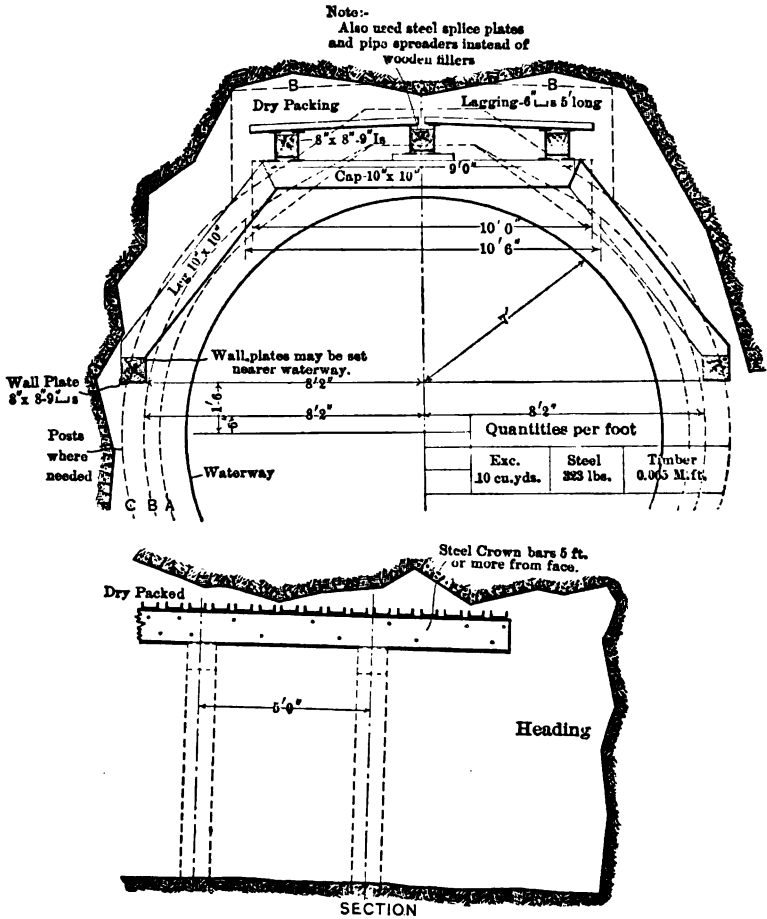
Contract €6. Shaft 17. Method of Supporting Poor Rock by Steel Crown-bars Over Temporary Wooden Bents.
